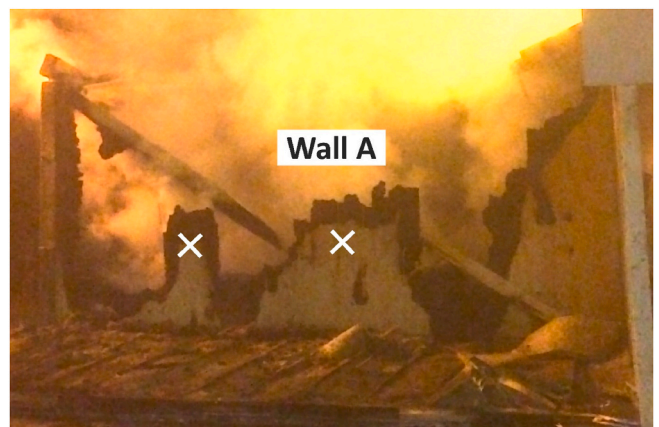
The remnant of the exposed CLT wall (Wall A). The CLT wall was remaining around the areas where the embedded TCs had been, marked with arrows, and close to the door leading to the corridor (right side). The light steel frame wall that was on the non-exposed side of the CLT is lying down in front of the wall. Photo by RISE Fire Research.
